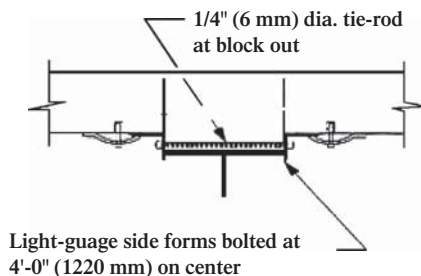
Grout dam built using light-gauge side forms (Queen Elizabeth Way–Welland River bridge, Ontario, Canada).
